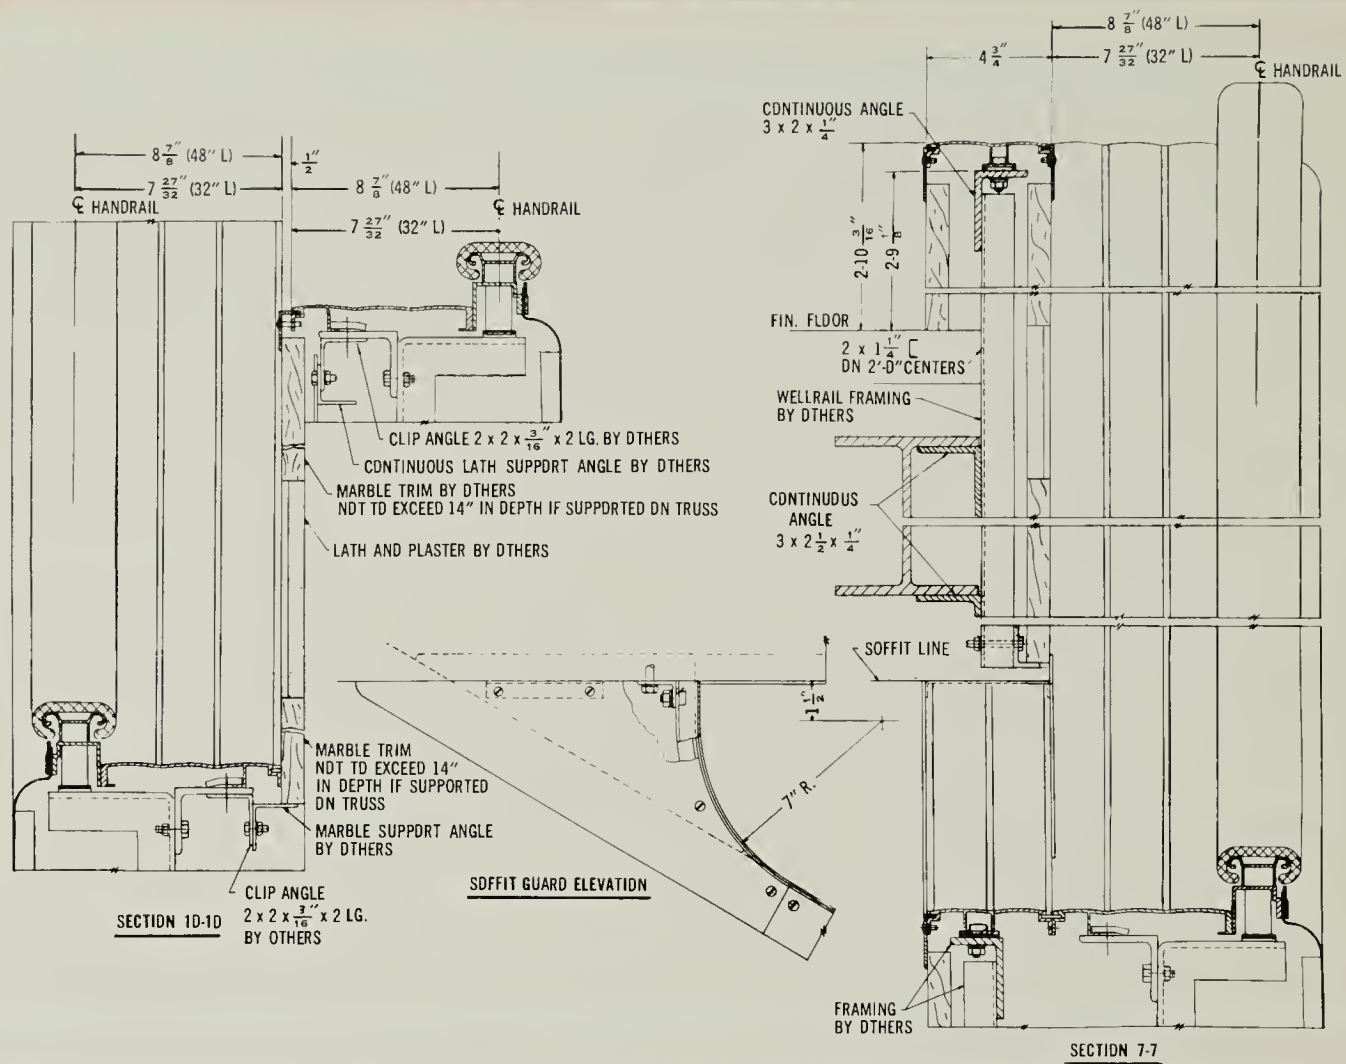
Sections Through Balustrade-Wellway Railing-Marble Exterior
